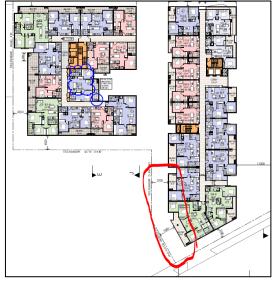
Comparison photo of plans at Level 3 of 162 Whitehorse Road
